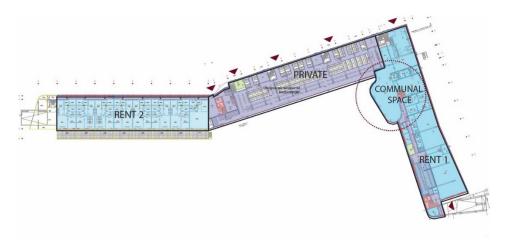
Scheme existing situation – main building parts. Scheme upon the original plan (Mecanoo Architects).
